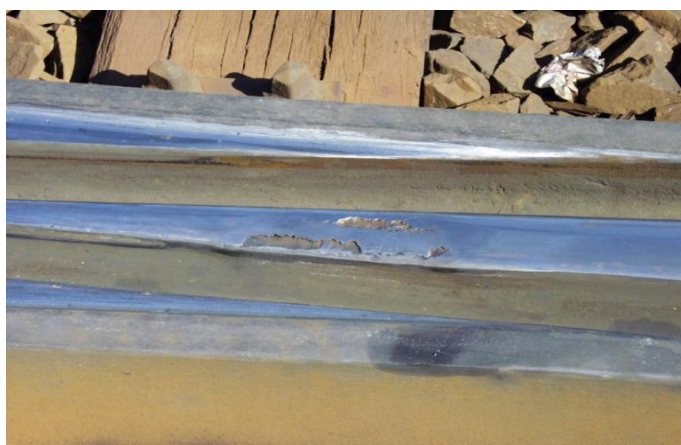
Example damage on crossing nose – spalling
